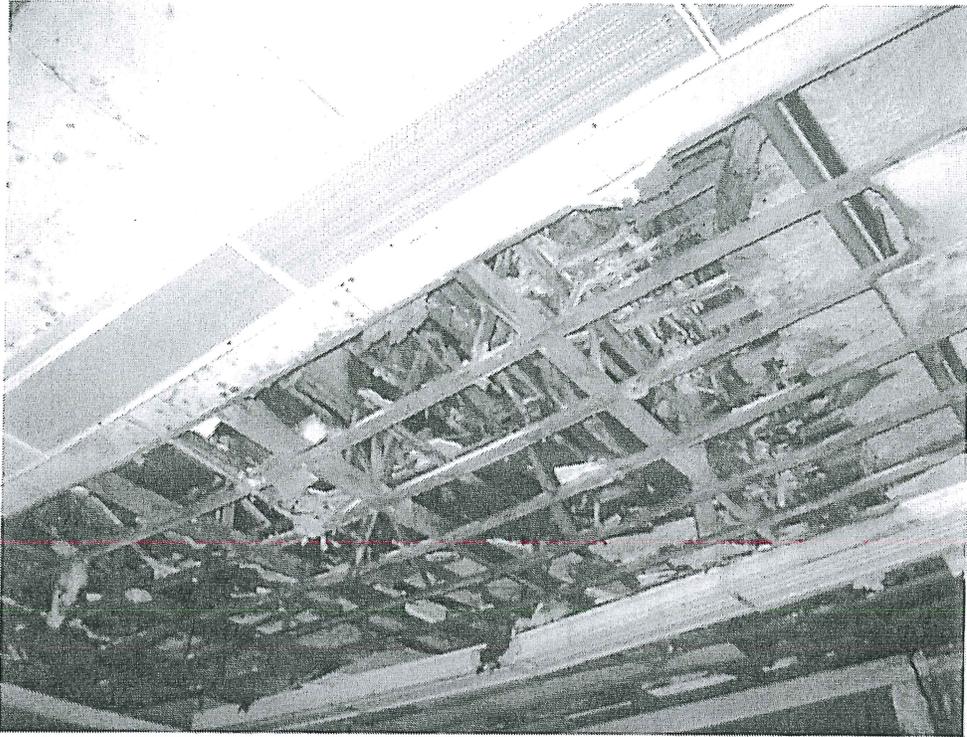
General view of the ceiling at the first floor of the Williams and Chester Bldg
